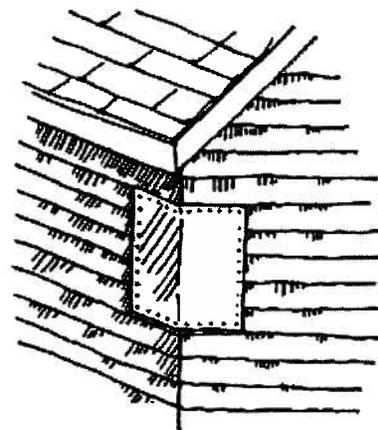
Raccoon access to rooftops can be eliminated by installing sheets of aluminum flashing, at least 3 feet square, around the corners of buildings.
